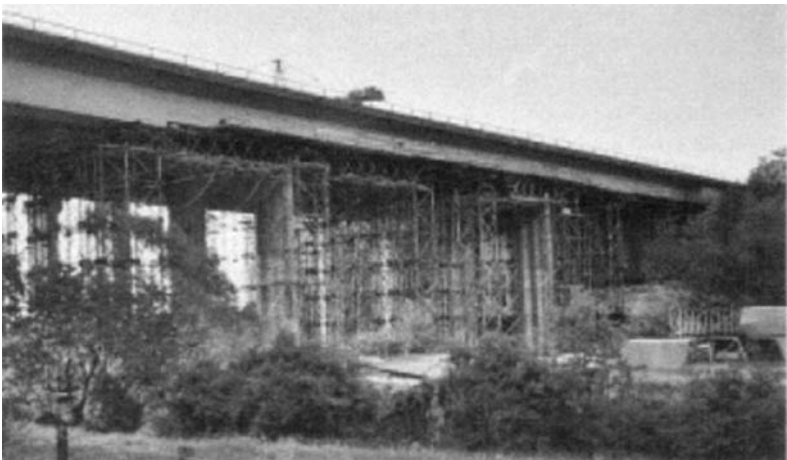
Pre-stressed reinforced concrete bridge where tendon ducts should be located
